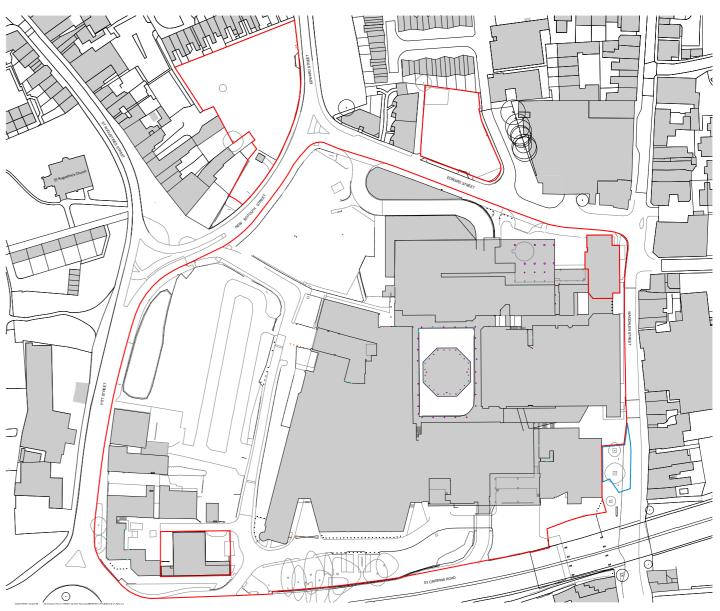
Hybrid Application Site Plan Source: Broadway Malyan Architects
